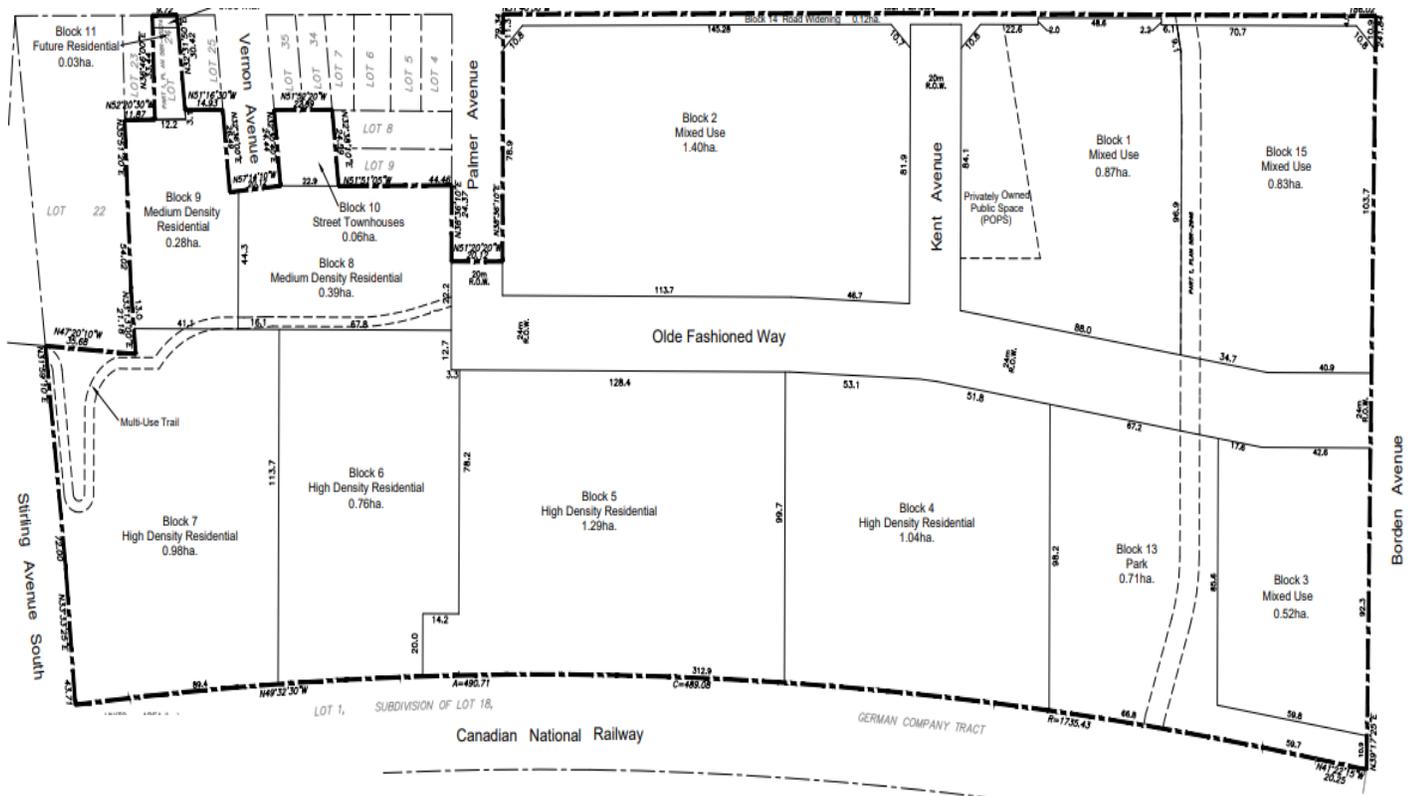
Proposed Draft Plan of Subdivision 30T-19201
